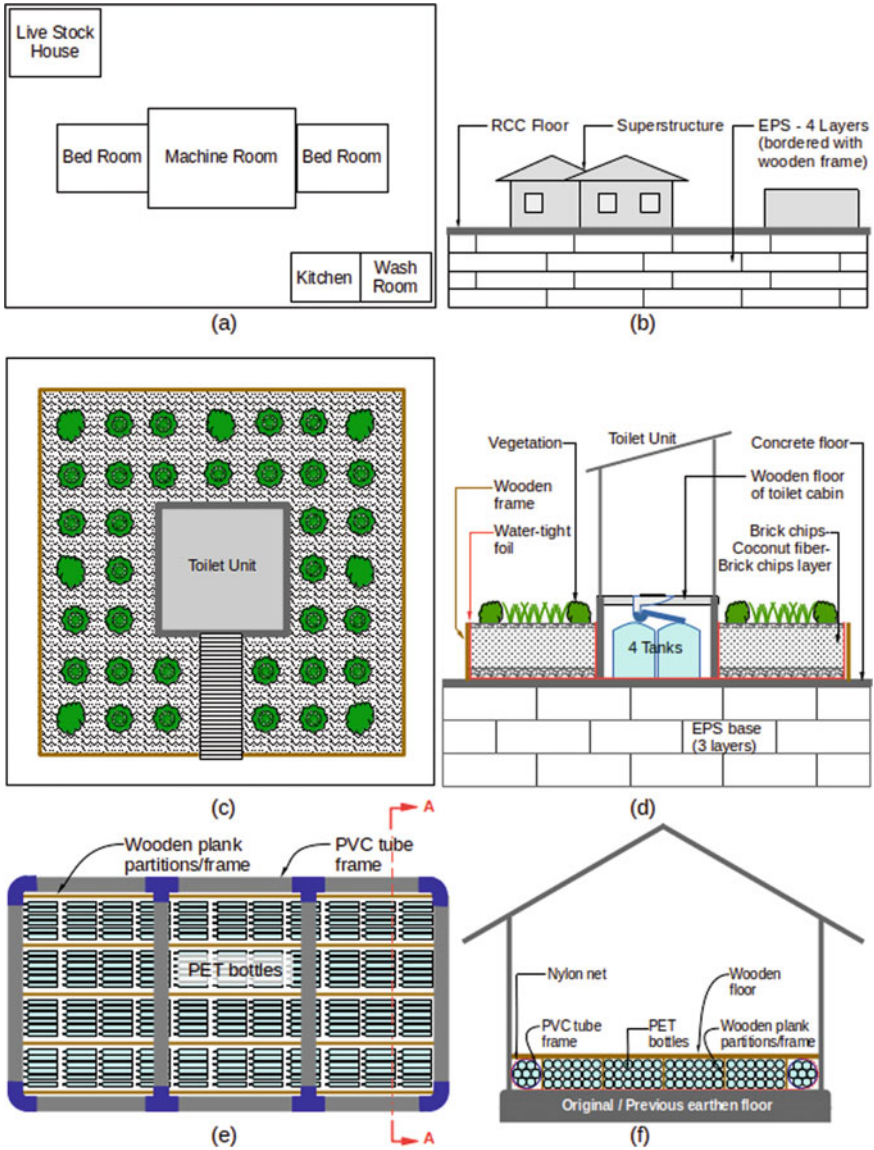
a Schematic plan of amphibious living unit, b schematic elevation of amphibious living unit, c schematic plan of amphibious toilet unit with constructed wetland, d schematic section elevation of amphibious toilet unit with constructed wetland, e plan below the retrofitted wooden floor, f elevation of section A-A of retrofitted floor (*Note* All designs are not to scale)
